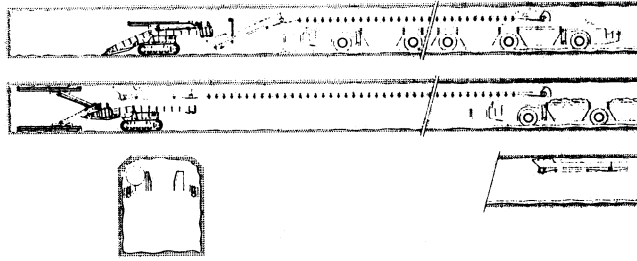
Schematic of face configuration in drill and blast method.
